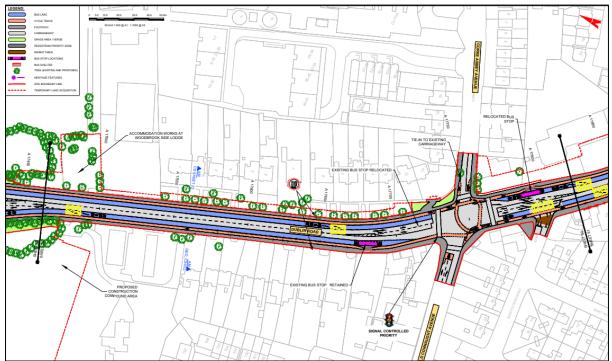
Extract from General Arrangement Drawings at Dublin Road, Bray (Sheet 50)
